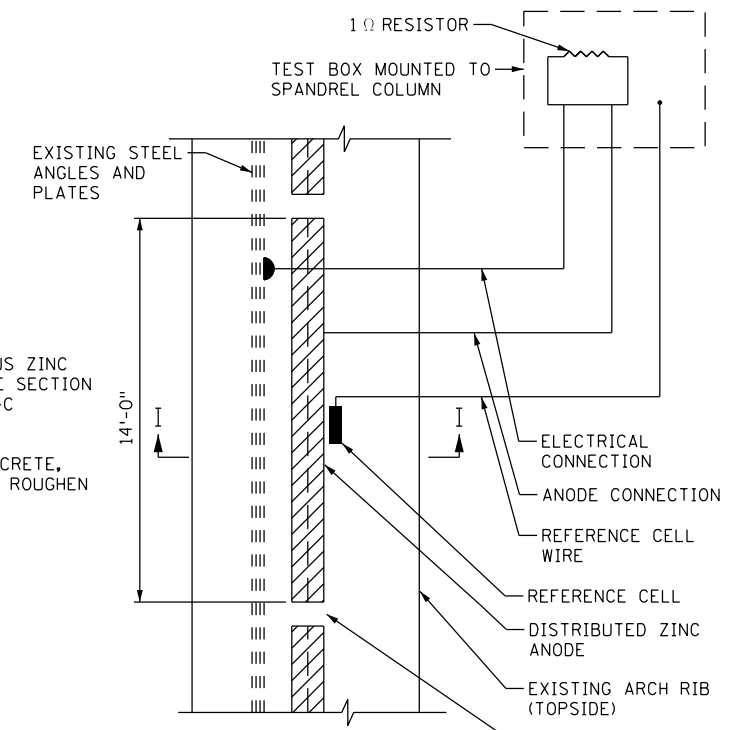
DETAIL E-E INTERMITTENT ELECTRICAL CONNECTION
